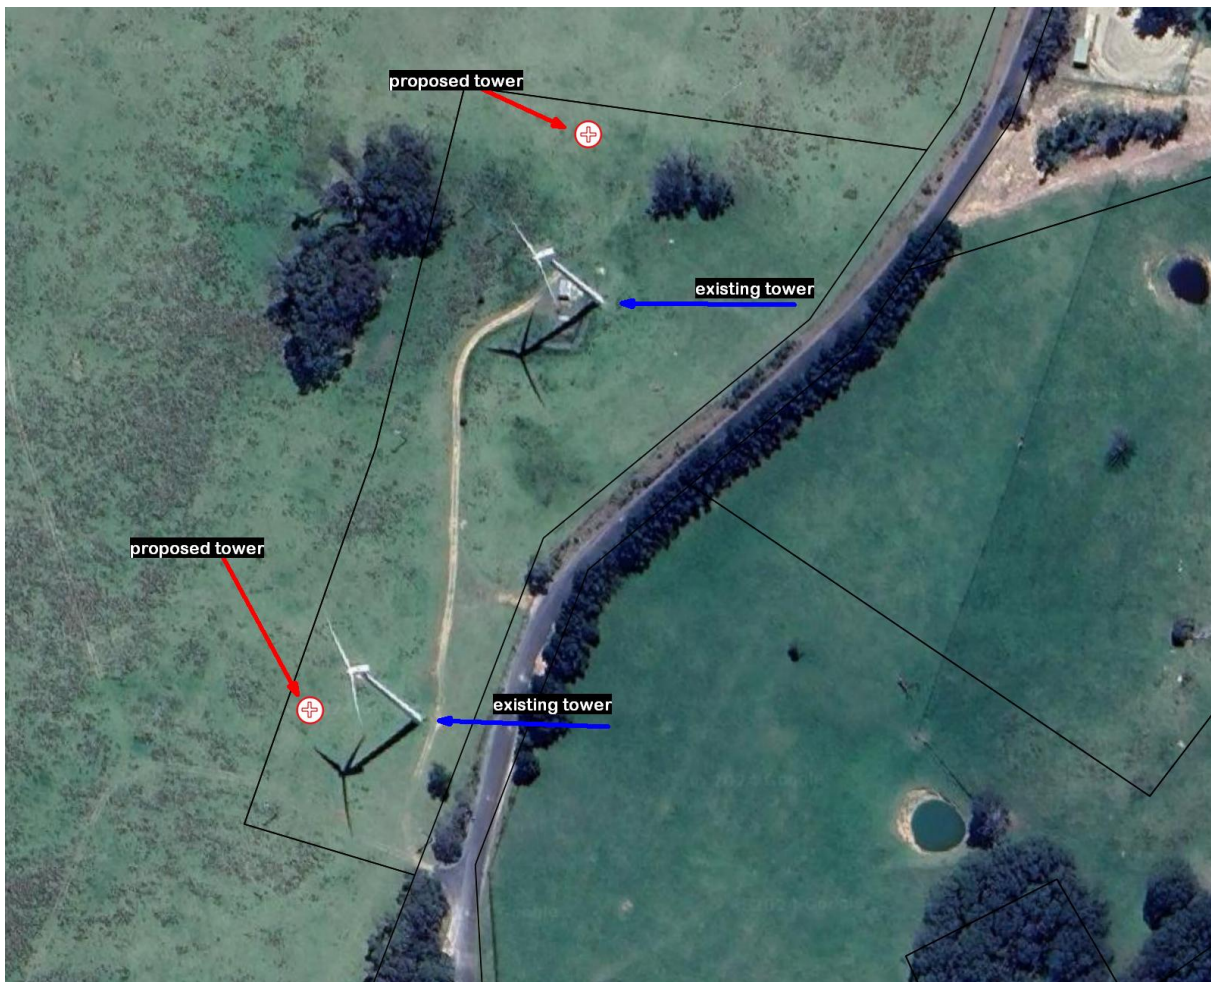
Plan depicting existing and proposed locations of wind turbine towers
